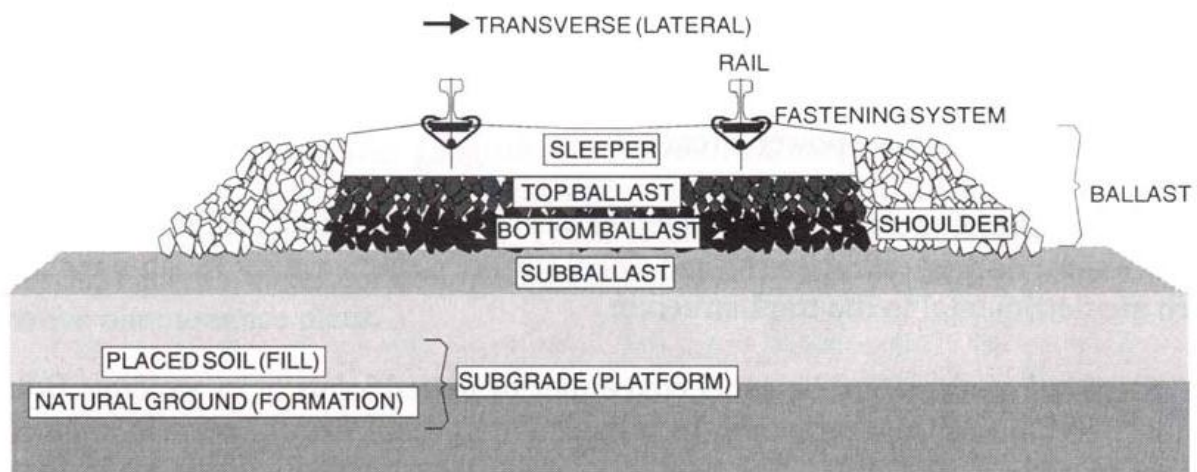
Track layout of a typical ballasted track- side view (Selig & Waters, 1994).
